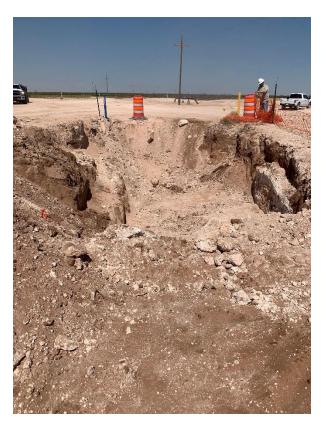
Off Right of Way Excavation – looking NW toward release point (electrical pole in distance)
